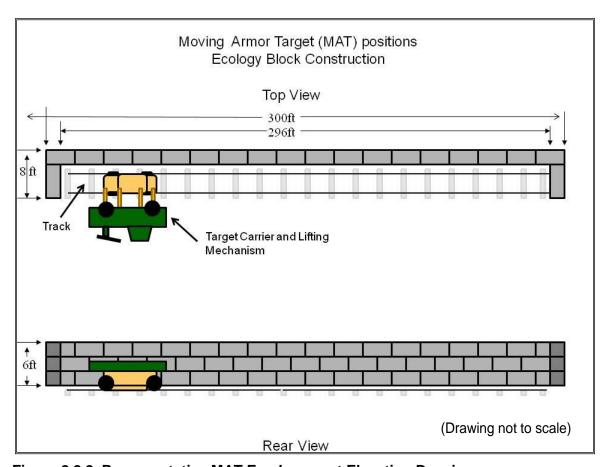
Representative MAT Emplacement Elevation Drawing
